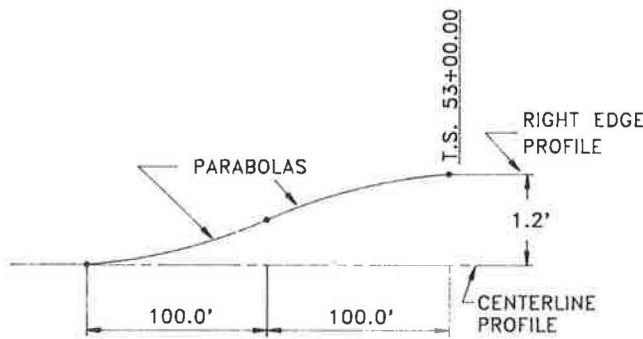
Beginning superelevation transition (Type 3) of example ramp.
